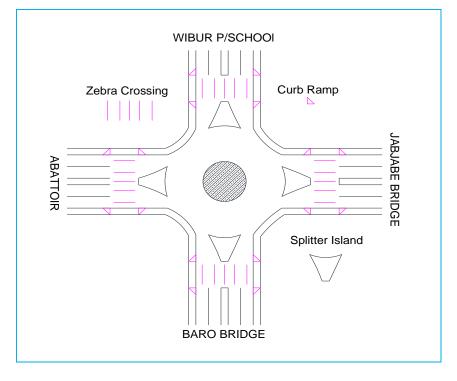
Suggested improvement layout of Ajwomara roundabout
